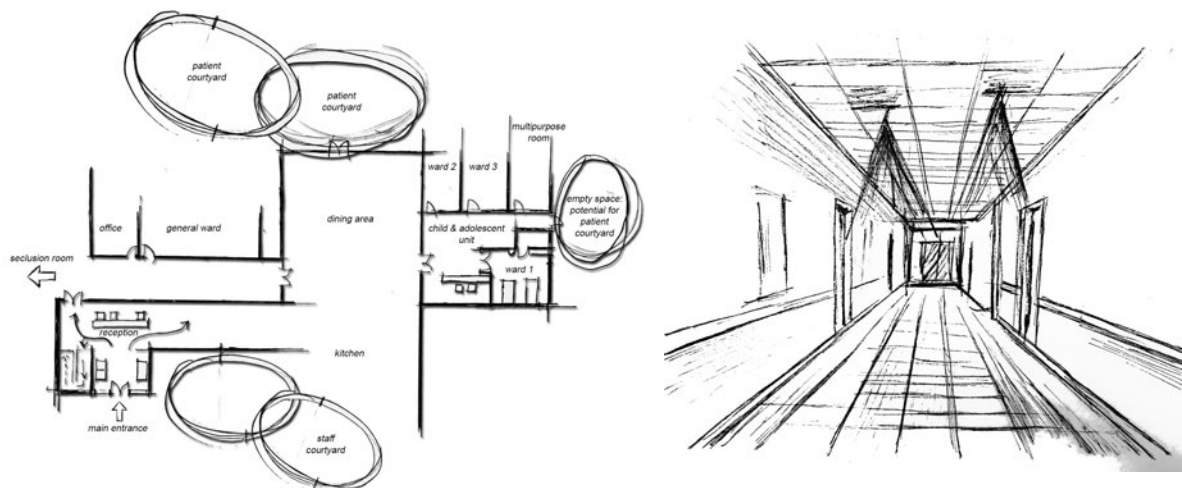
(left) : Quick sketch of the floor plan/ spatial layout.
